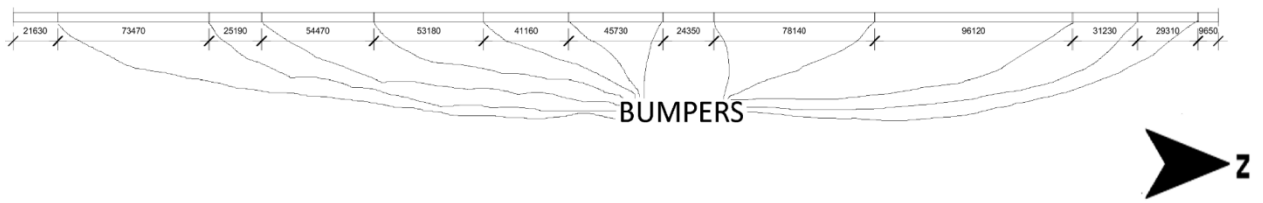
(p): Approximate architectural urban road layout design of the chosen concrete cement road (scale=1:1500)
